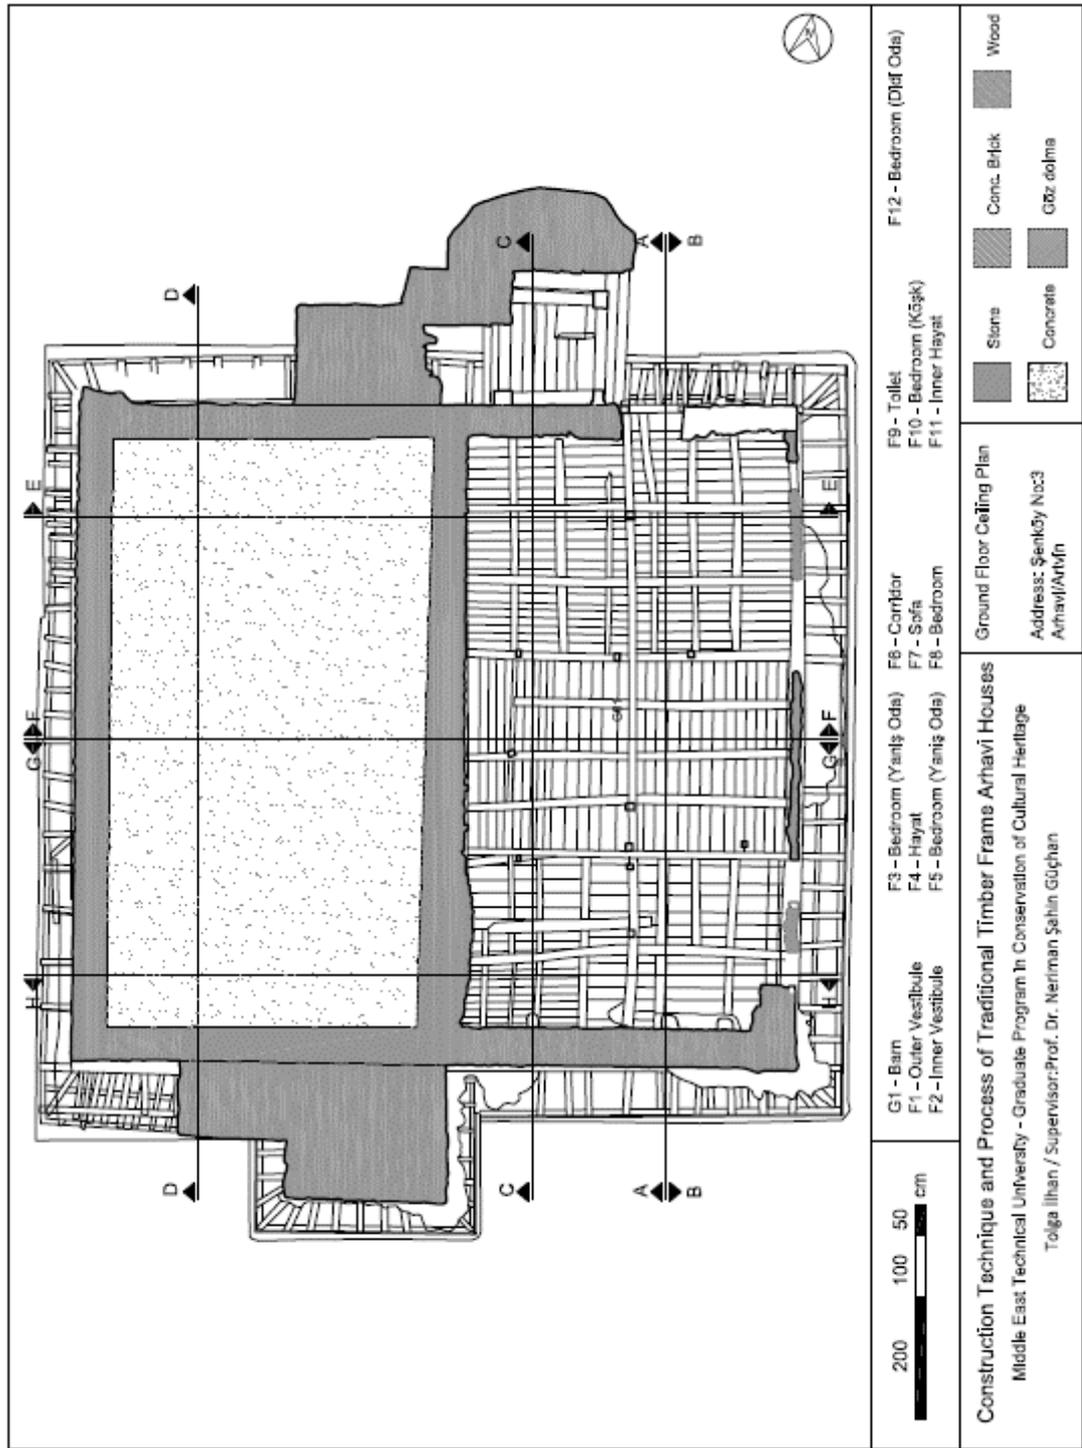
Ground Floor Ceiling Plan of Şenköy 3
